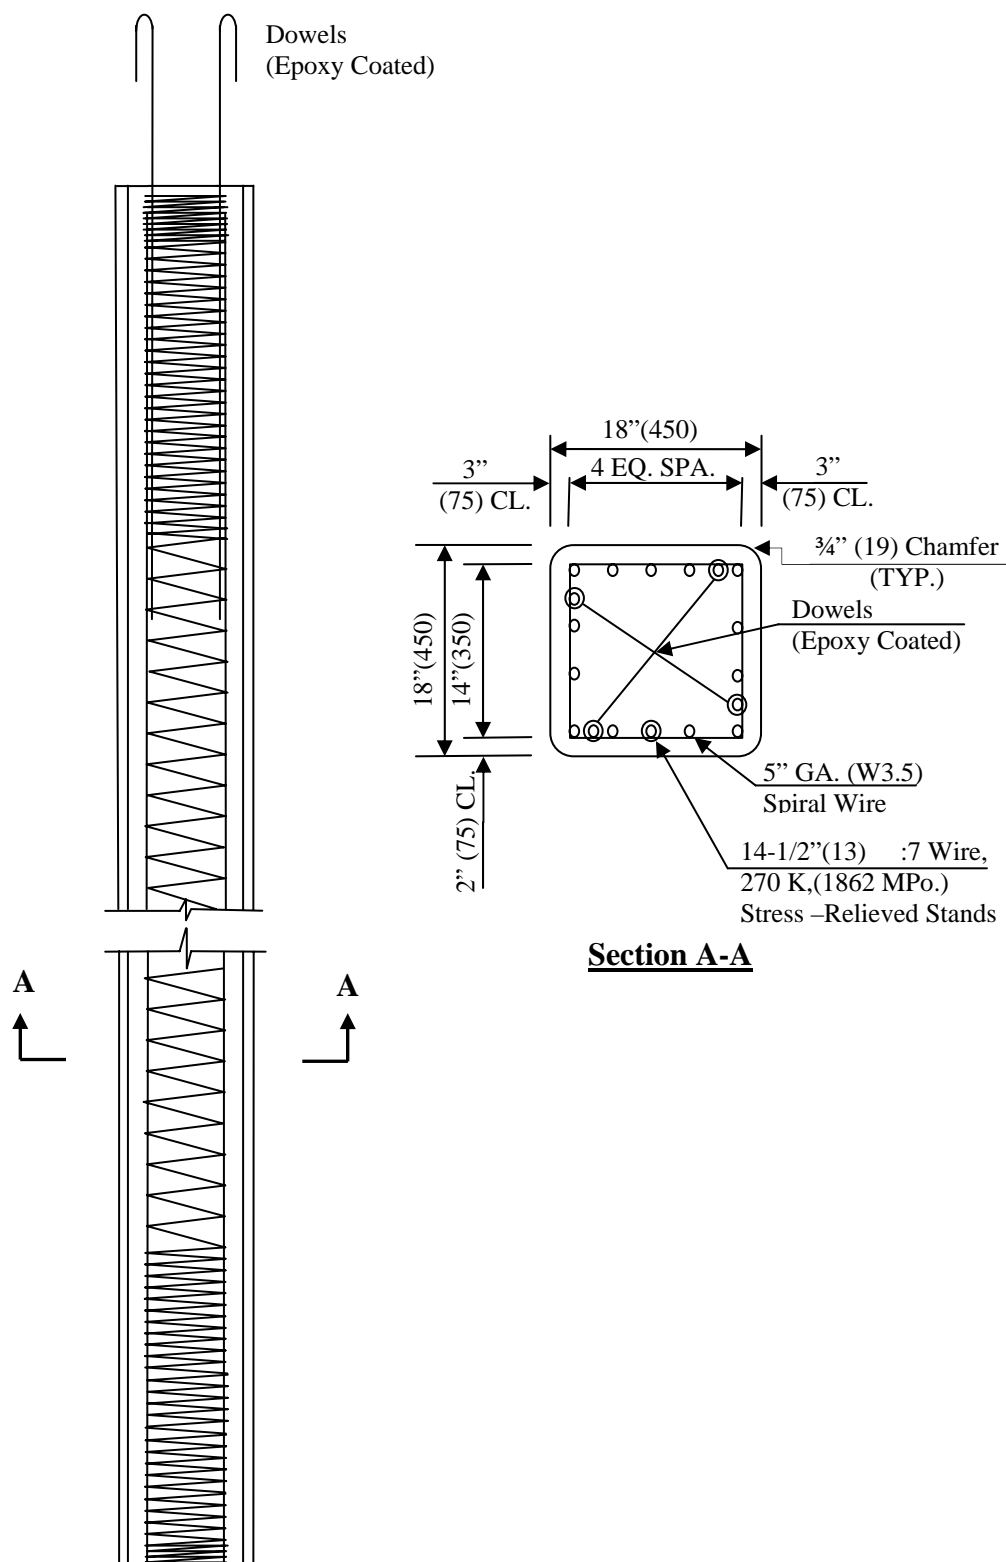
Typical Precast-Prestressed Concrete Pile Details (Delaware DOT, 2005)
